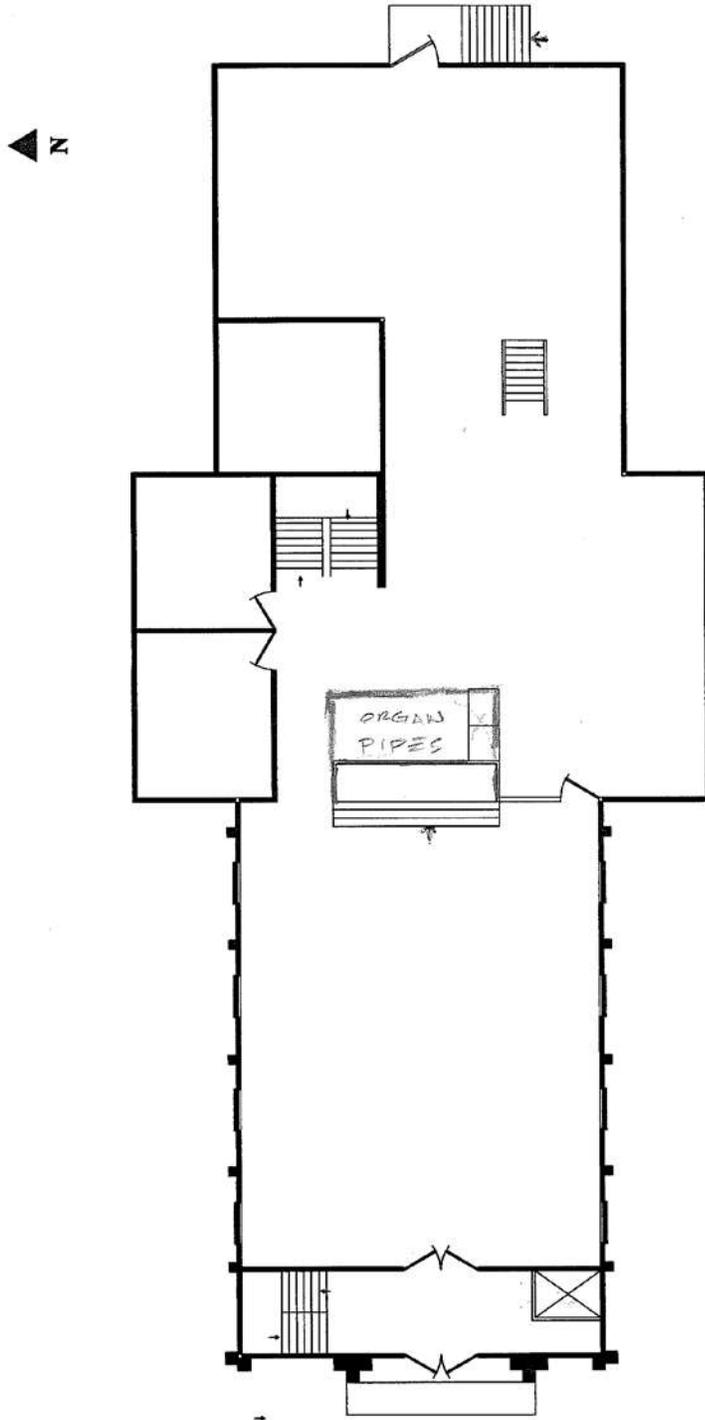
Figure E First Presbyterian Church. Second Floor Plan (Sanctuary. Current. Not to scale).
